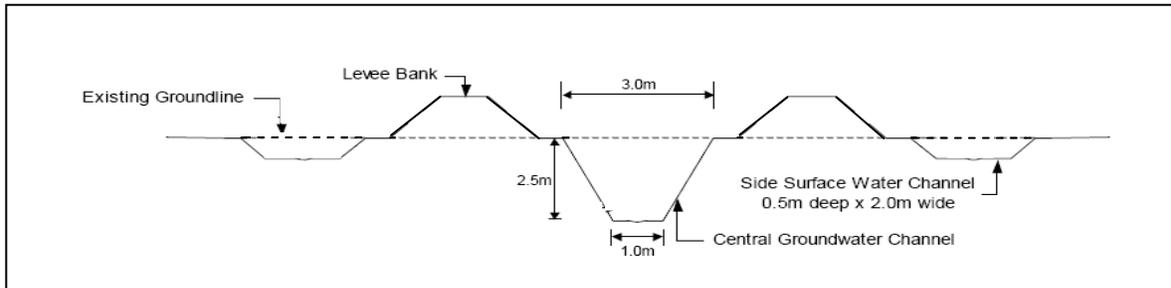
Cross section of proposed drain, showing the separation of groundwater and surface water.
